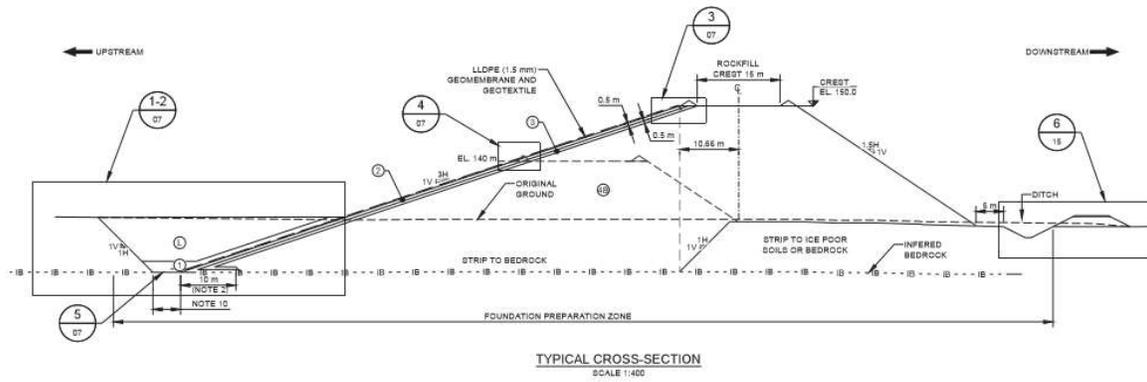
Typical Cross-section of the Saddle Dams 3/4/5
